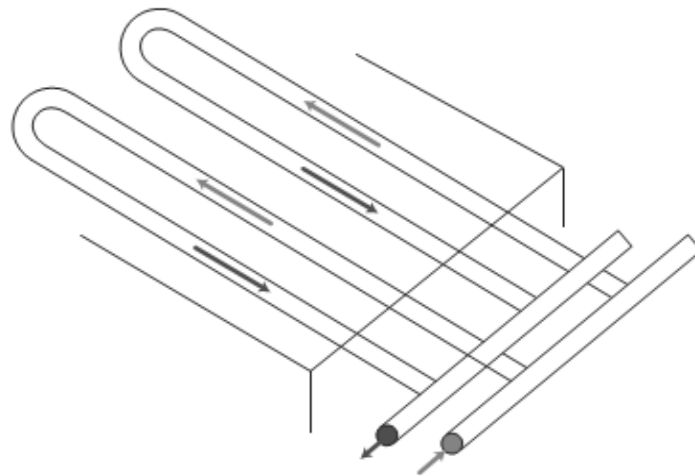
Heating pipe distribution for a soil warming system inside a greenhouse (Nguyen, 2015)
